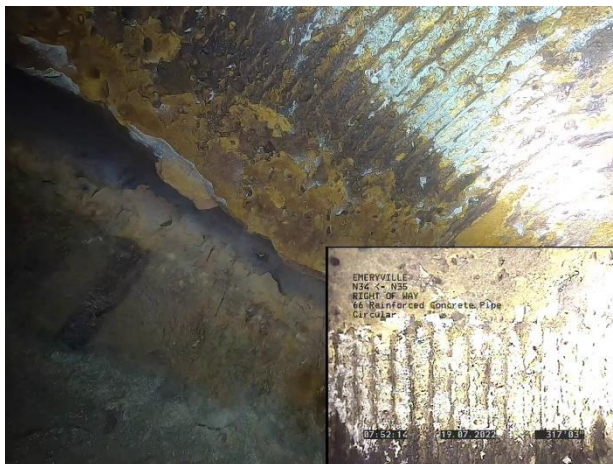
VANDA Level 5 condition with exposed reinforcing steel; 318 feet upstream from N35 up to manhole N34
